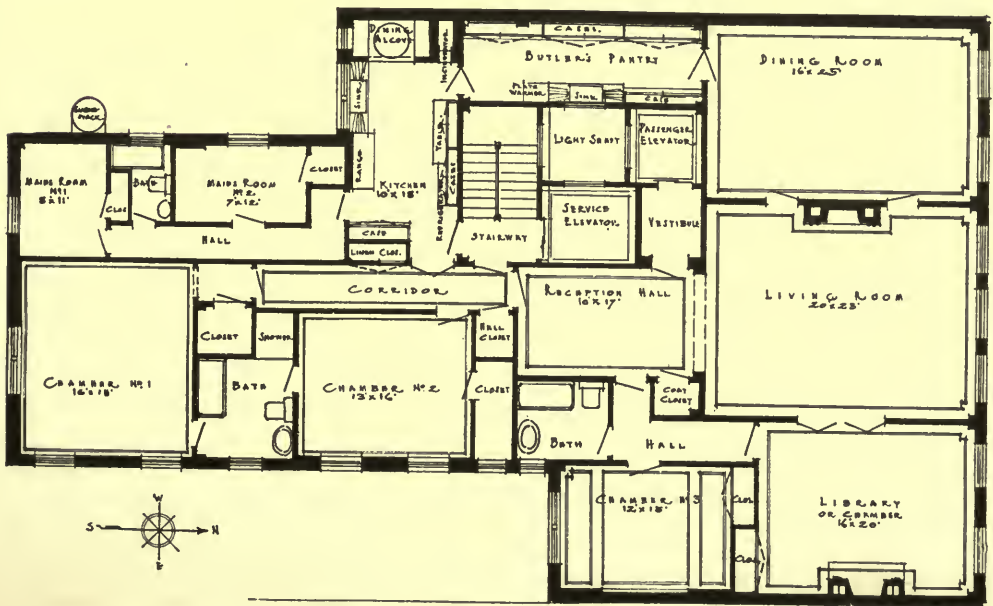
TYPICAL FLOOR PLAN OF APARTMENTS AT 257 EAST DELAWARE PLACE,
